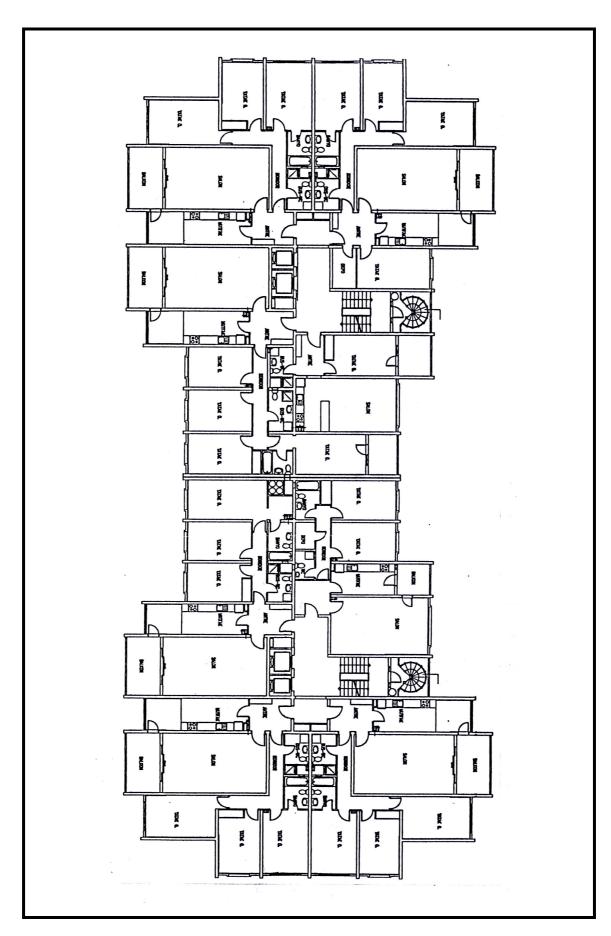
Mavişehir I; Pamukkale and Selçuk Typical Floor Plan of floors higher than the ground floor
